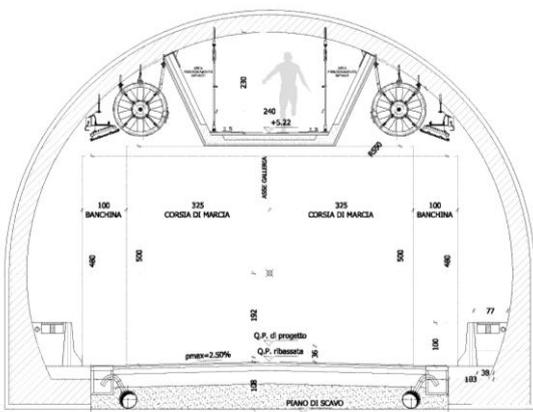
Cross section of Serralunga tunnel line adequate with the Suspended Emergency Escape Route
